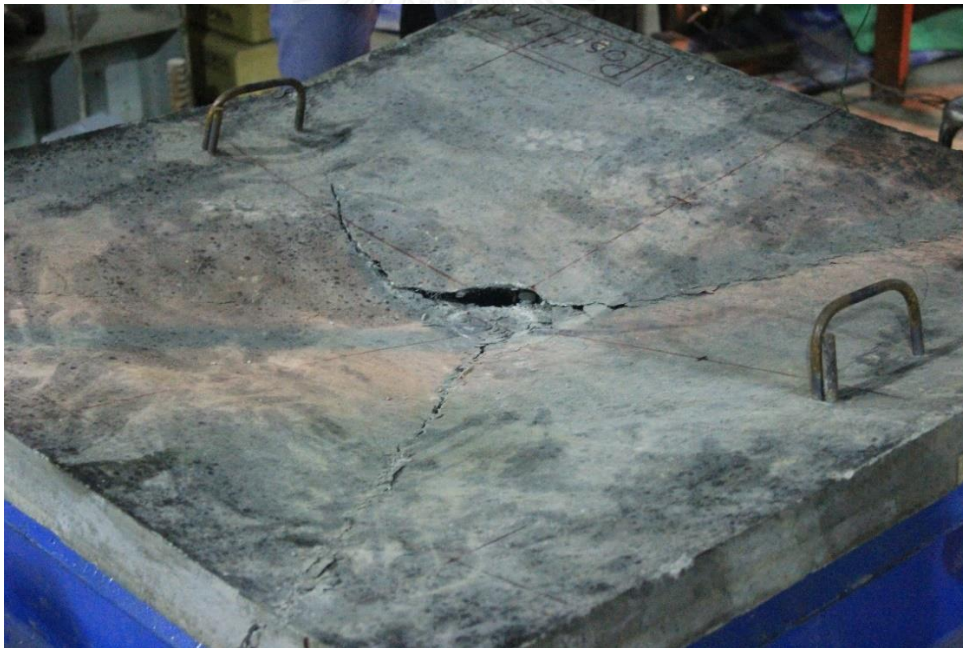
Typical punching shear failure of UHPFRC slabs with steel reinforcement and without fiber
